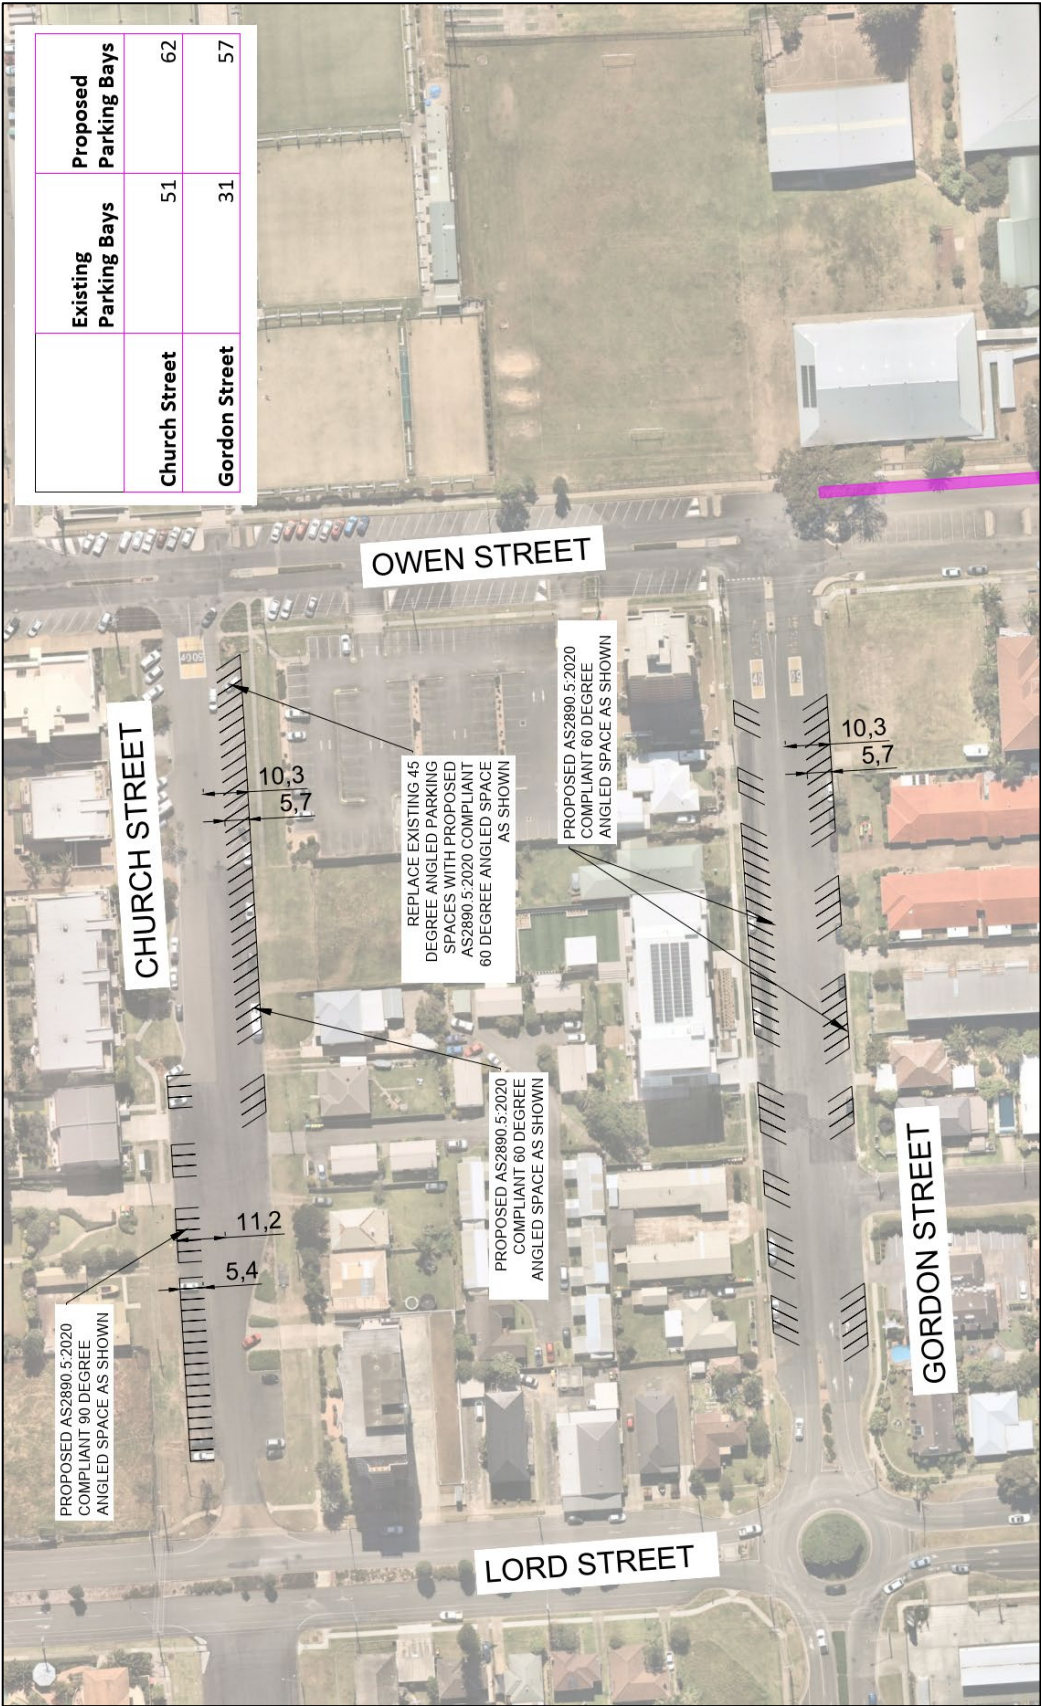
Proposed On-Street Parking Modifications – Gordon Street & Church Street
